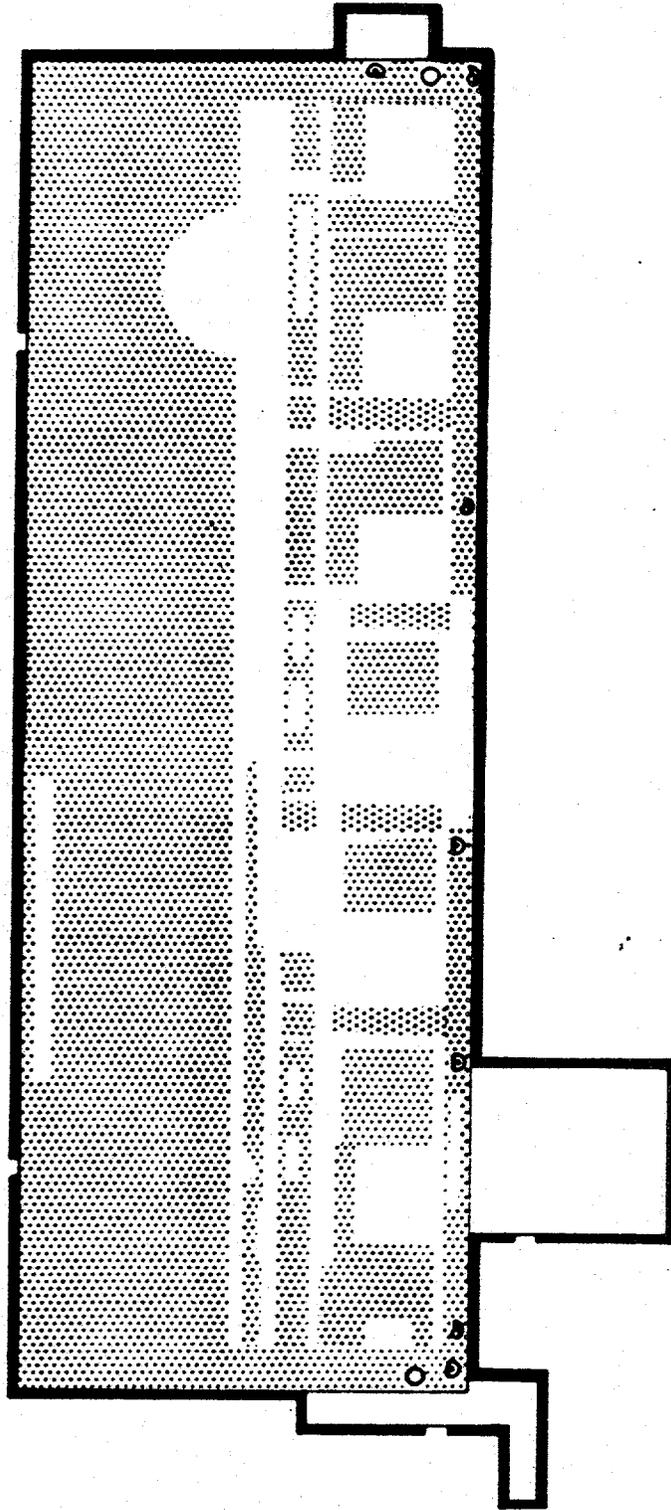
BASEMENT - PIPE TUNNEL FLOOR PLAN BLDG. 3019
